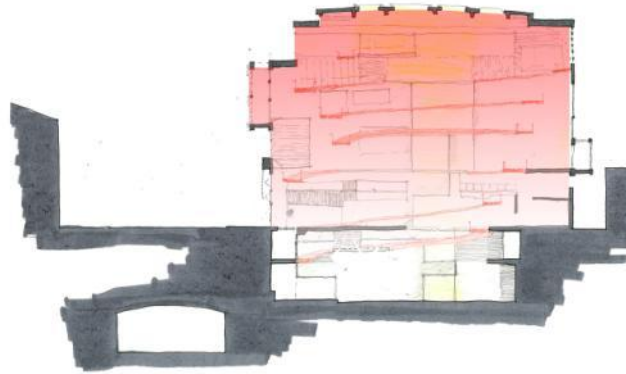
Section through the Wellness Atrium with street front to alley visual connection
